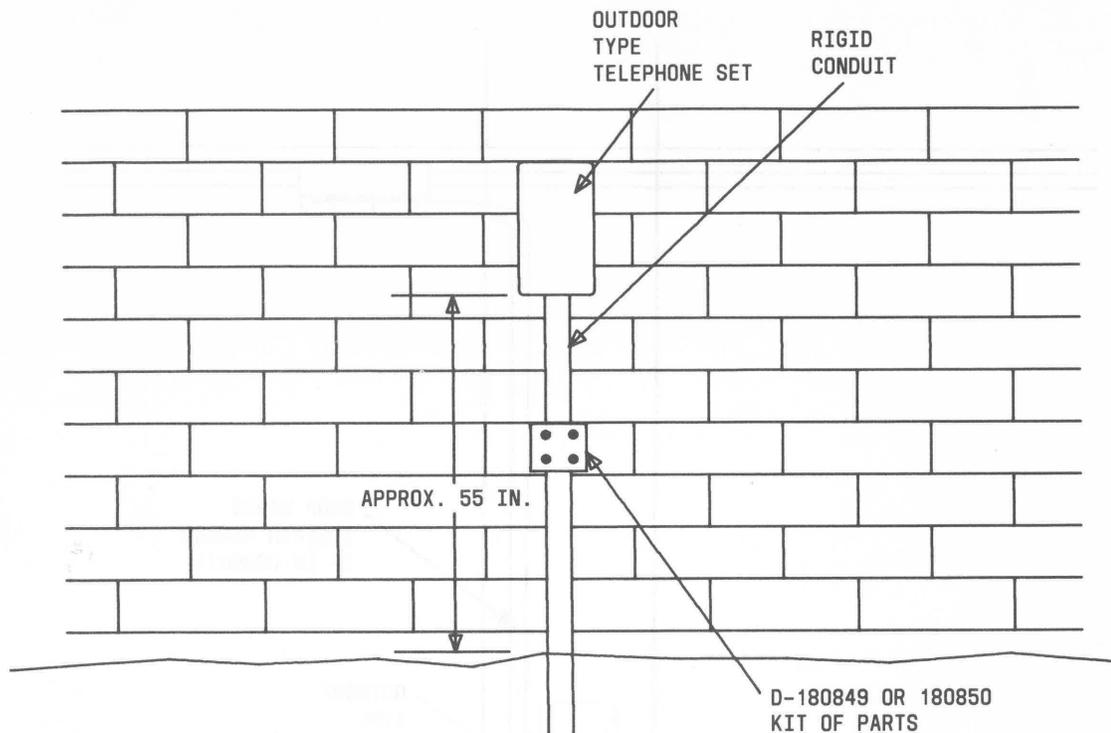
Outdoor Type Telephone Set, Wall Mounted Using a D-180849 or D-180850 Kit of Parts
